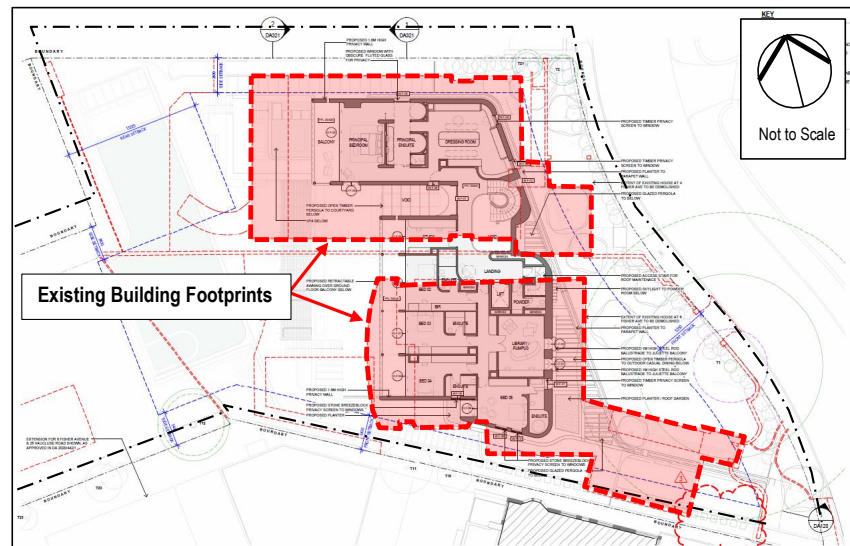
First Floor Plan Demonstrating Improved Interface and Increased Building Separation with Adjacent Properties
